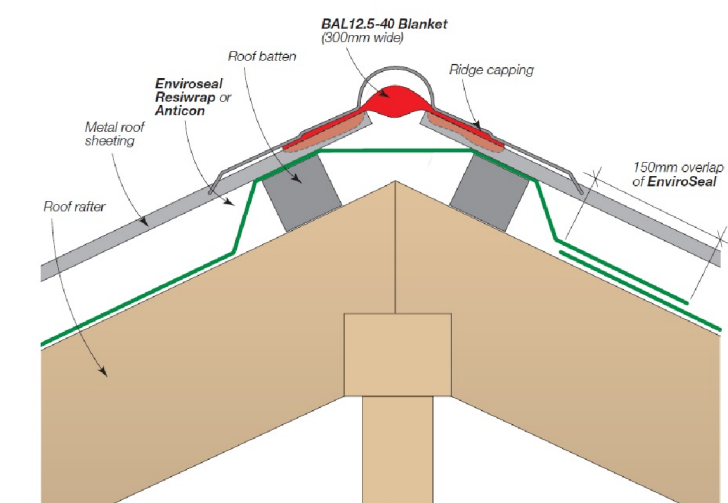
Hip/Ridge Detail – Steel Roof (BAL-12.5 – BAL-40)
